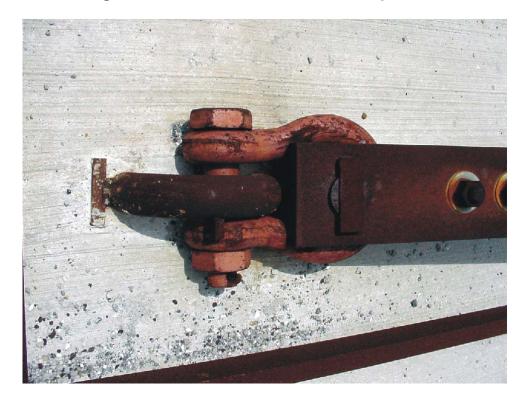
Commercial Shackle Replacing Fractured Welded Link
